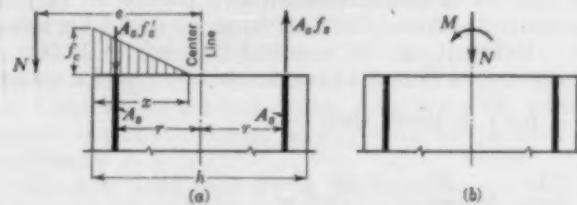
AN ECCENTRIC LOAD APPLIED OUTSIDE THE KERN OF A REINFORCED CONCRETE COLUMN
